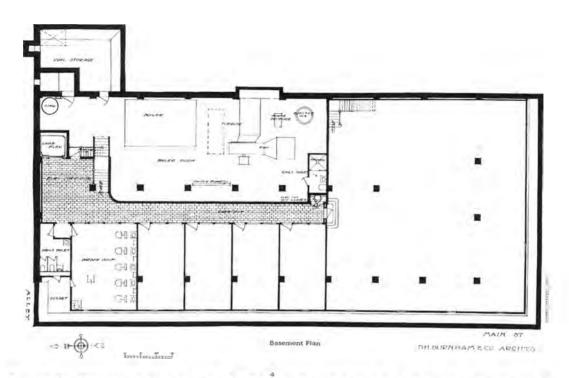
Basement plan in June 1910 promotional booklet (Putnam Trust collection).
